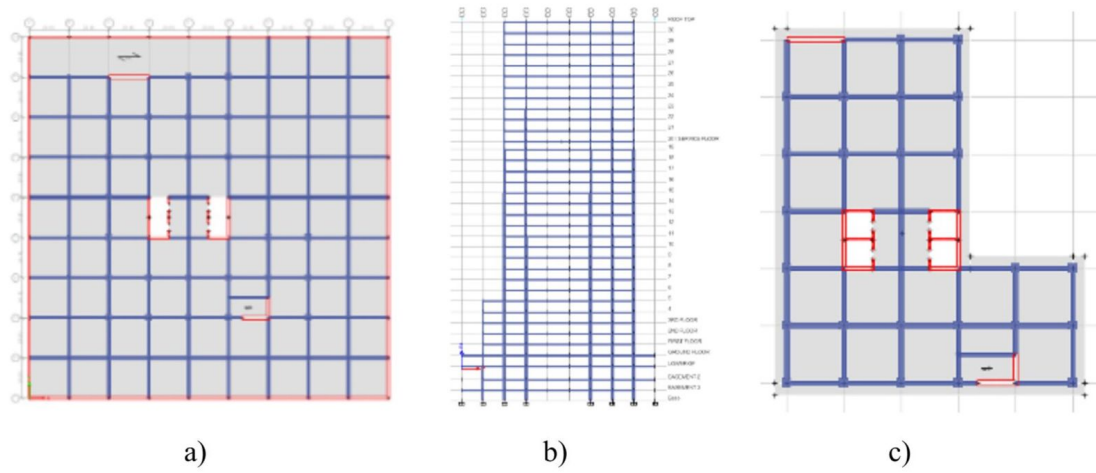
Plan view of building developed in ETABS a) Basement Plan b) Elevation c) Roof Top Plan
